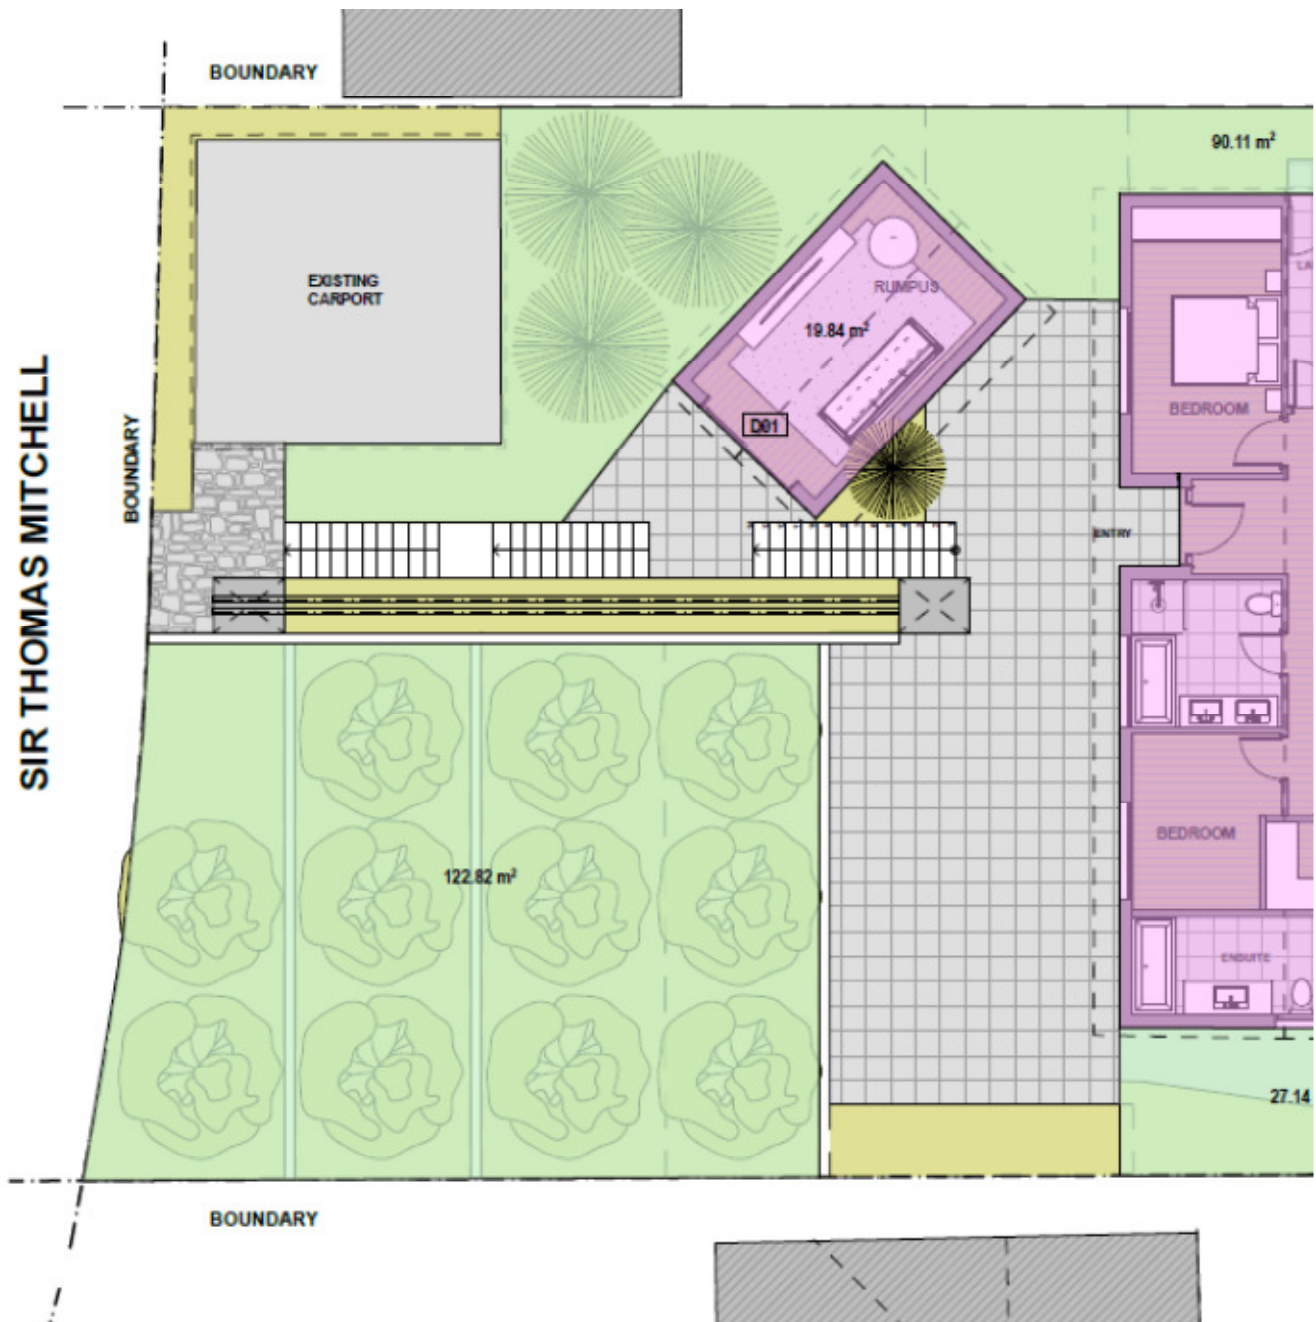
Area Calculations Plan extract. Terrace walls indicated?
